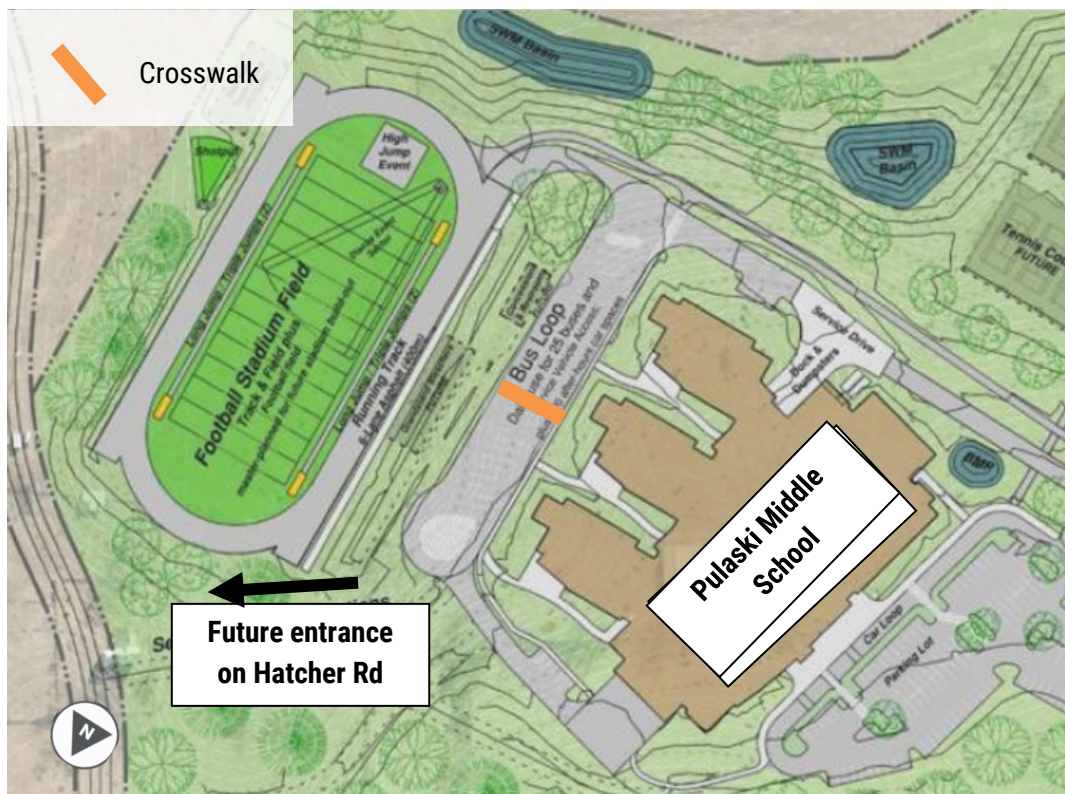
2018 School site plan. The school's back parking lot is large and has no clear, safe way for pedestrians and bicyclists to cross to Hatcher Road or the football field. There are sidewalks on the northwest and southeast sides of the back parking lot.
